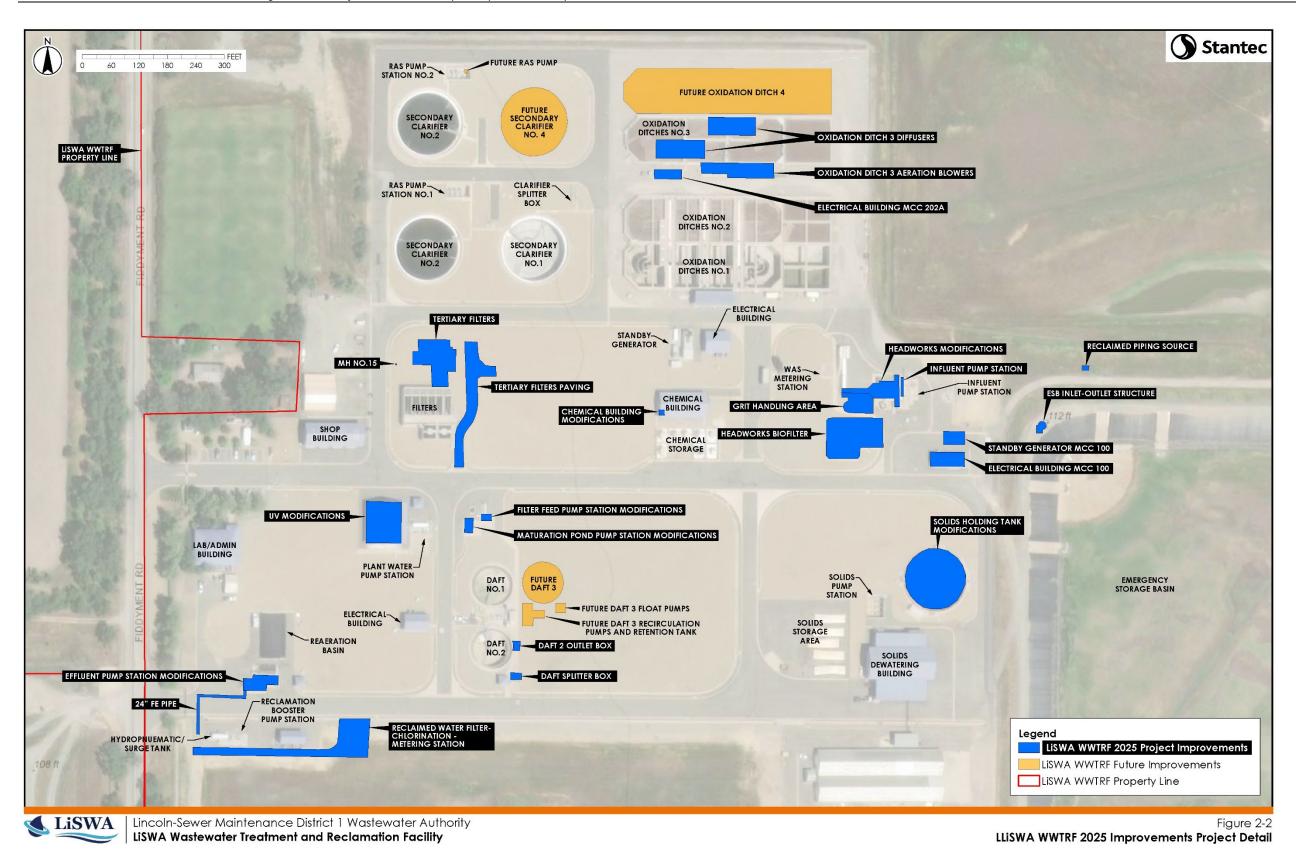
LiSWA WWTRF 2025 Improvements Project Detail
